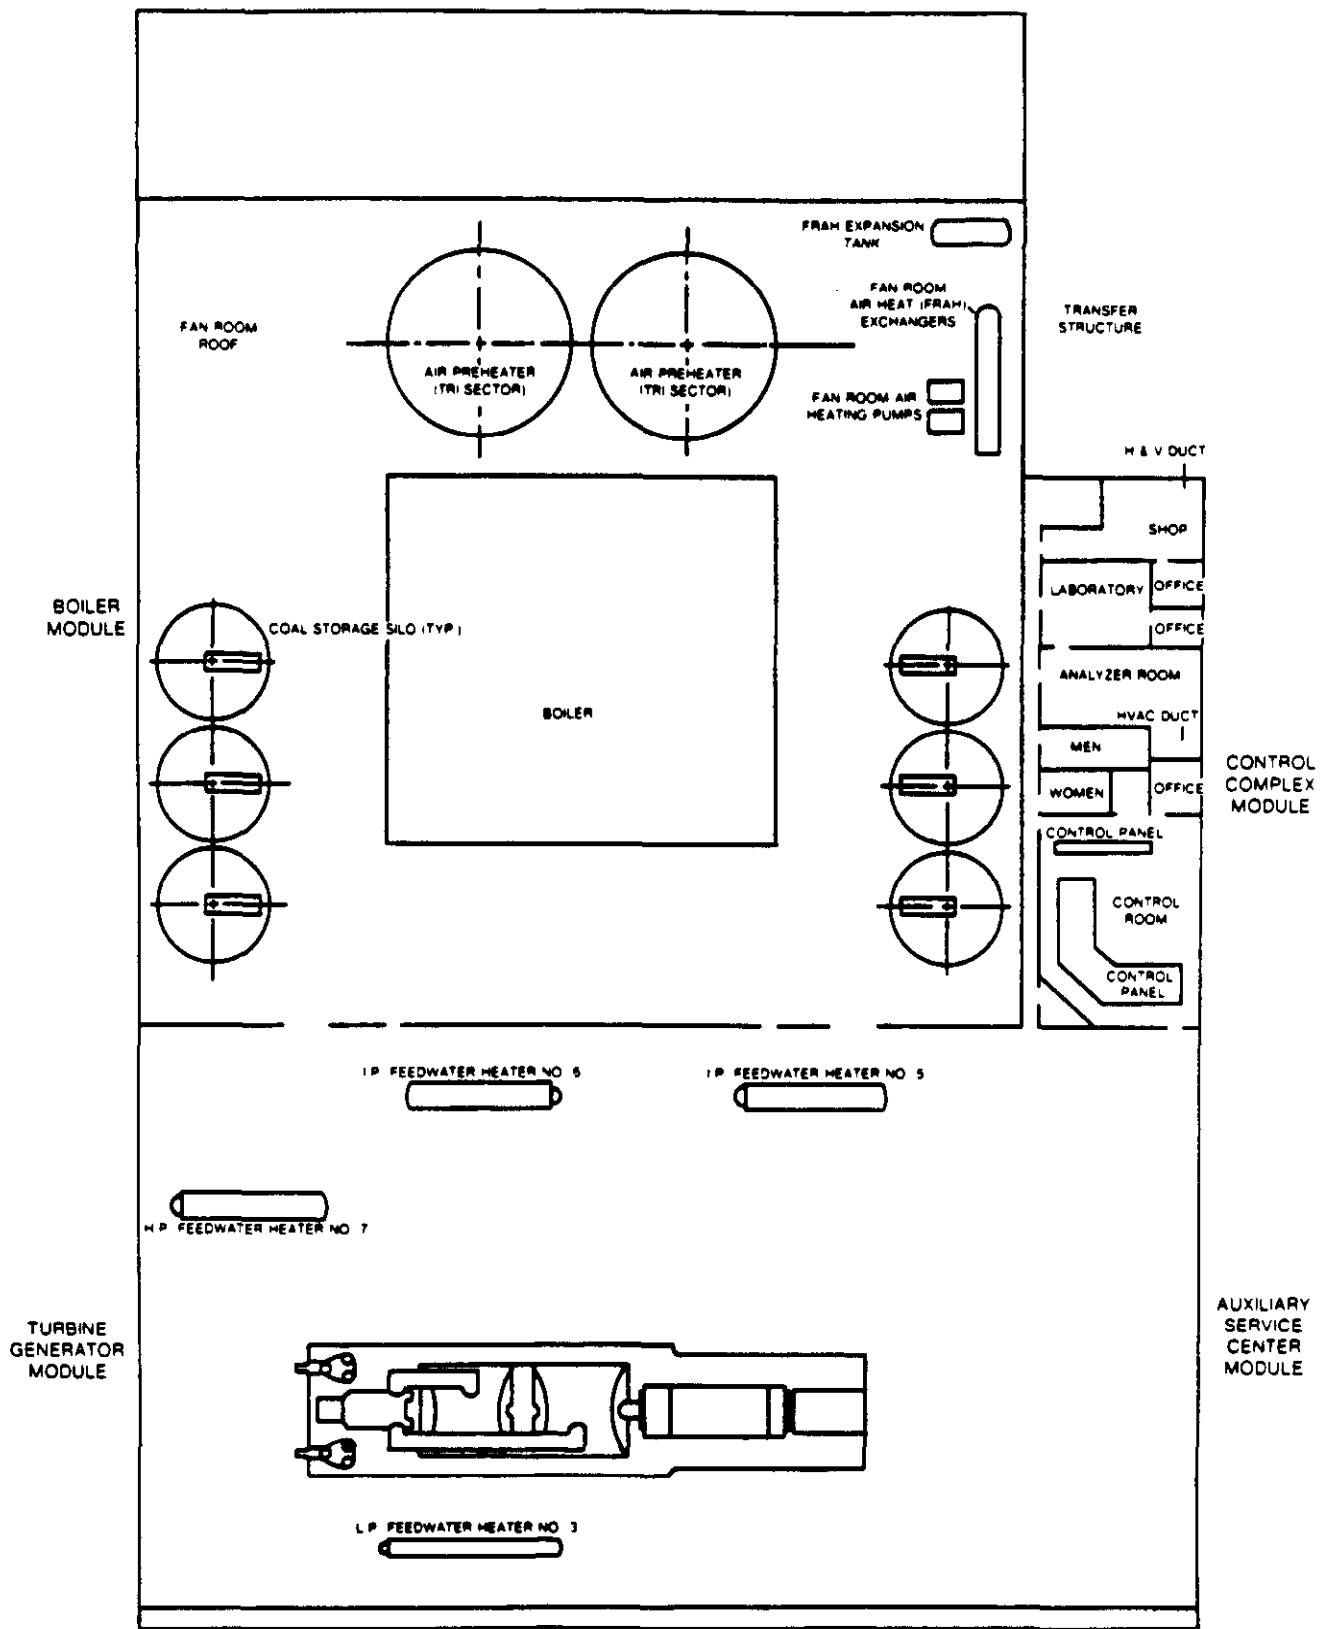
300 MWe Reference Plant Arrangement Plan Operating and Feeder Floor
